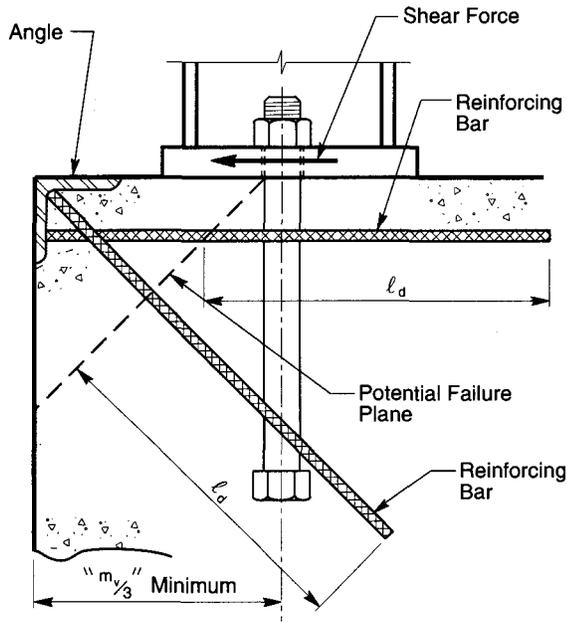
Concrete Reinforcement Due to Lack of Edge Distance for Shear
